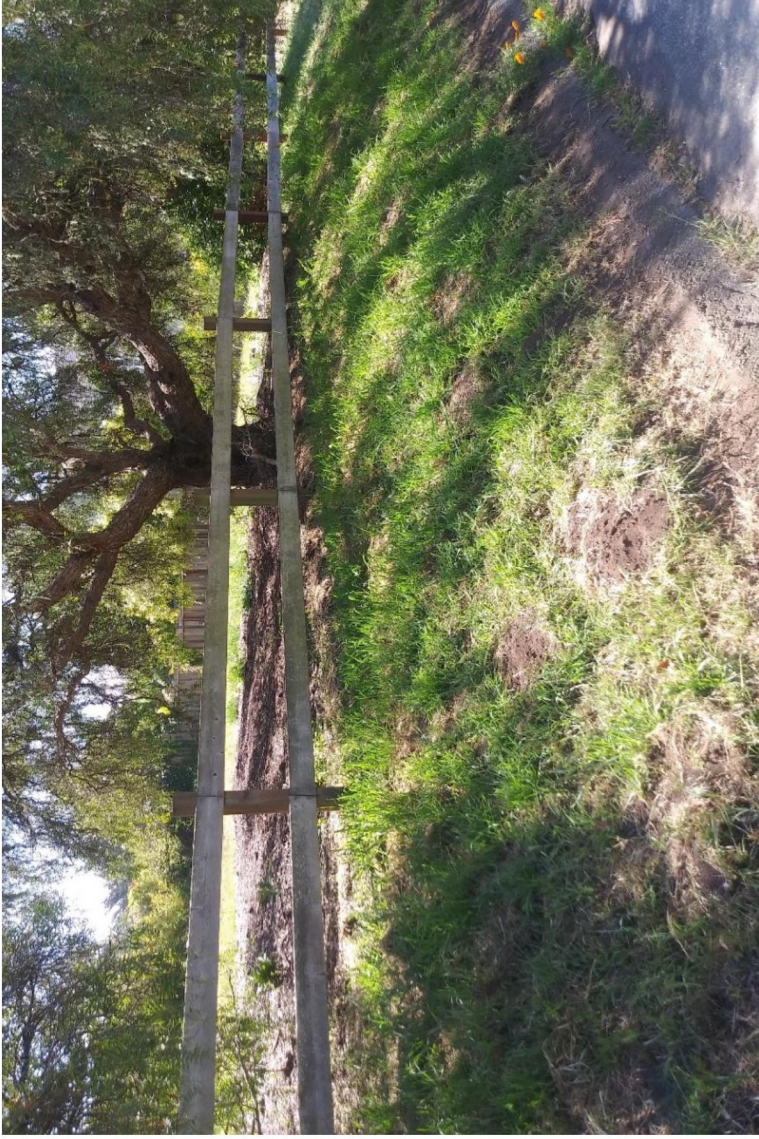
Gravel Driveway and Fence/Gate of Northwest Corner of Project Site
